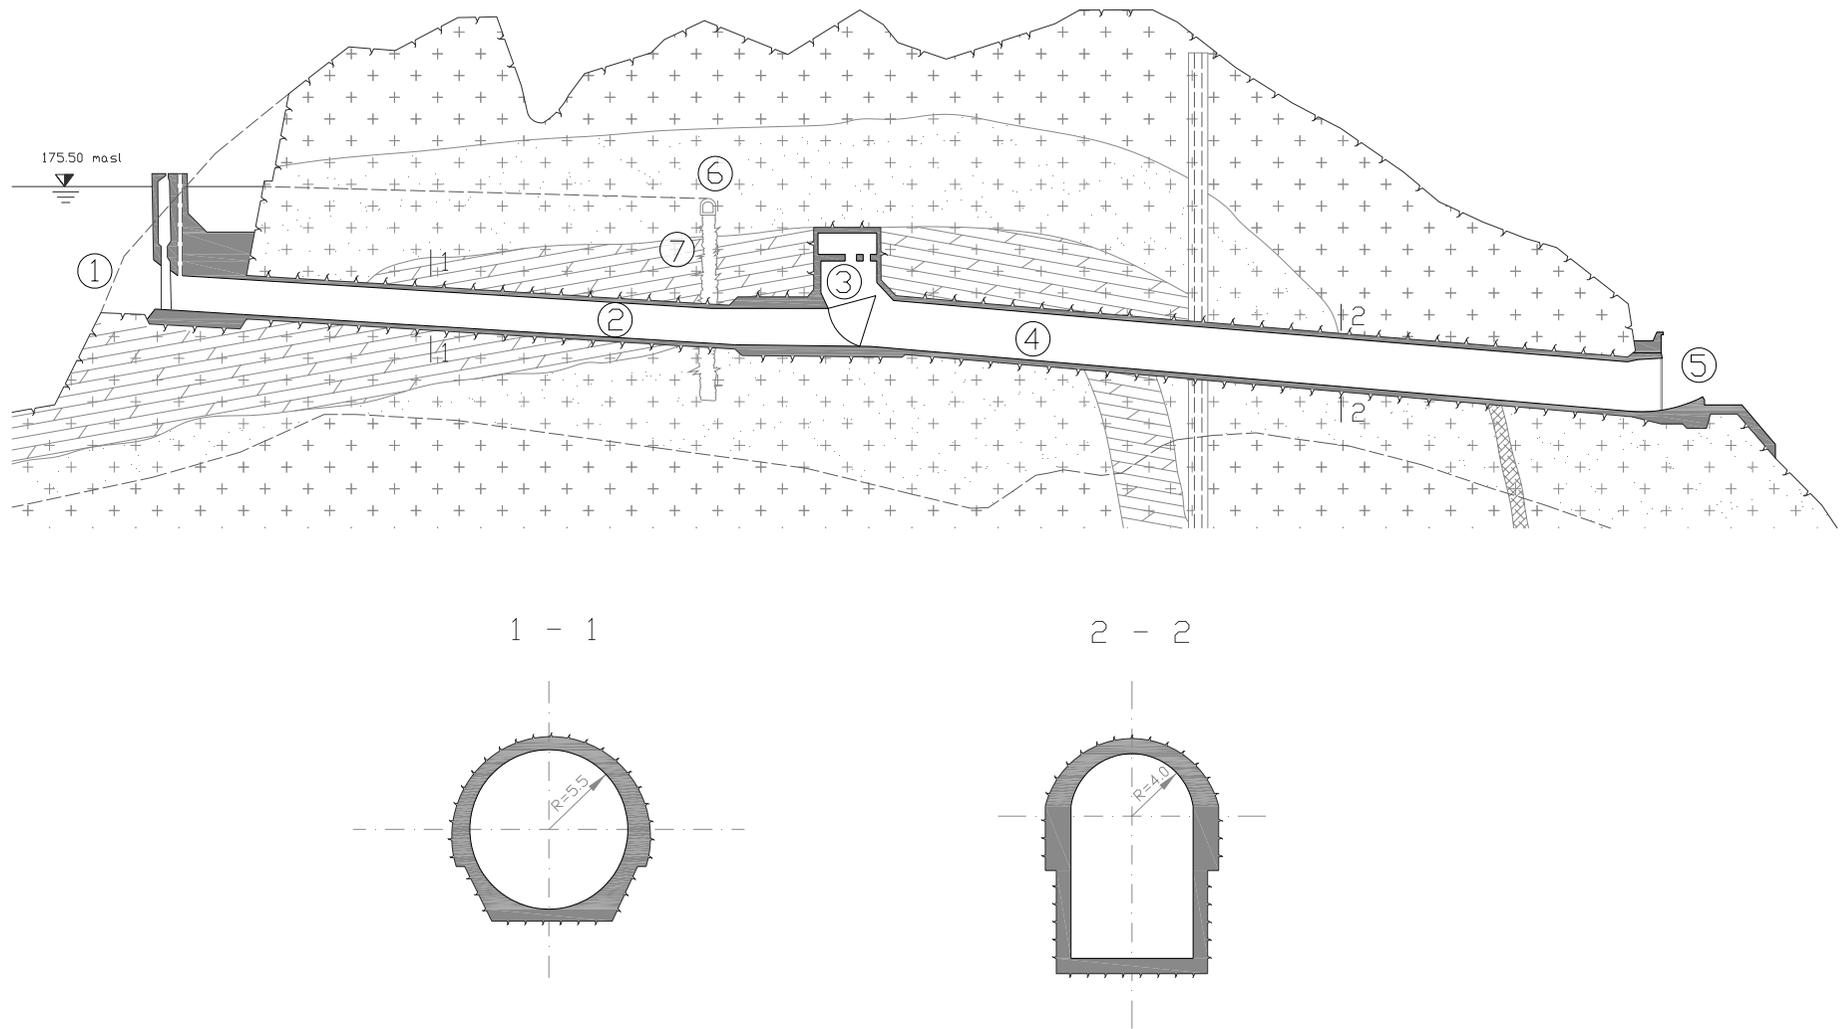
Longitudinal profile of tunnel spillway No. 4. ①: spillway intake, ②: pressure tunnel, ③: spillway gate, ④: free flow tunnel, ⑤: flip bucket, ⑥: access gallery, ⑦: grout curtain.
